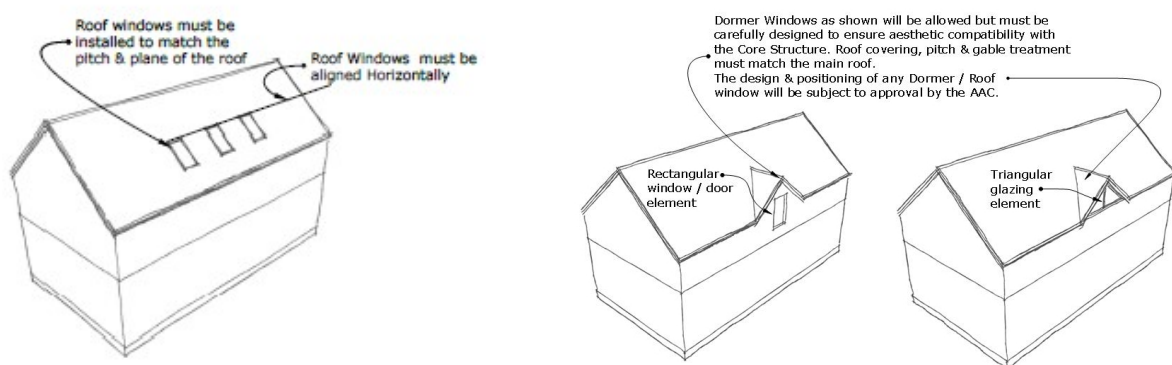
Examples of dormer windows which may be used subject to AAC approval
